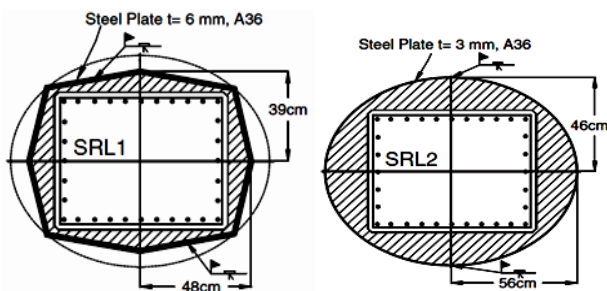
Steel jacketing details of lap-splice deficient columns: (a) specimen SRL1 and (b) specimen SRL2.
